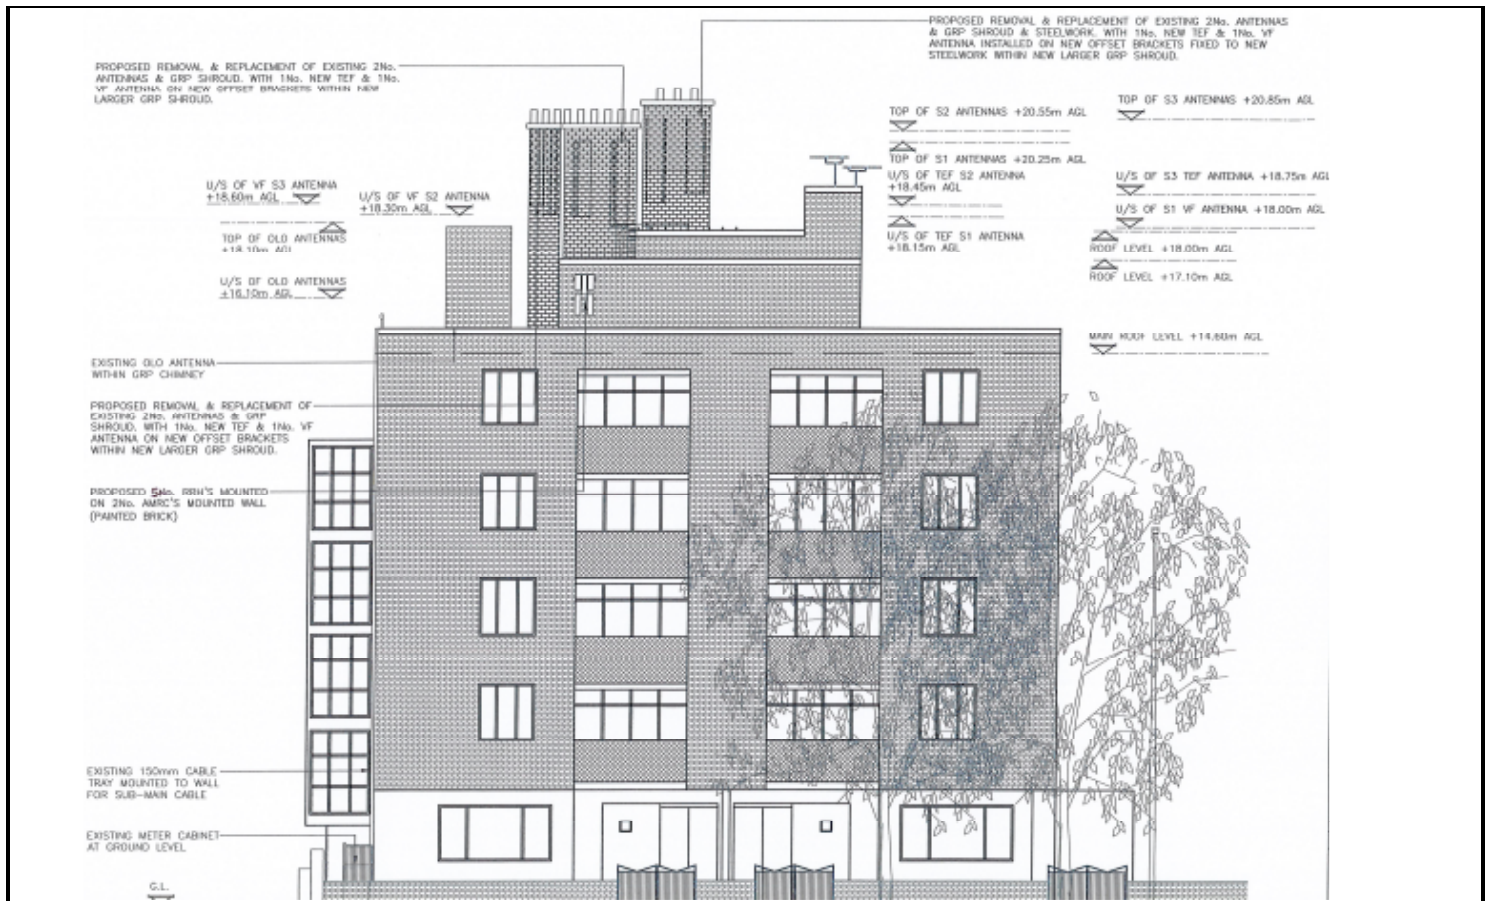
proposed east (front) elevation A (extract from drawing number 302-A issue A)
